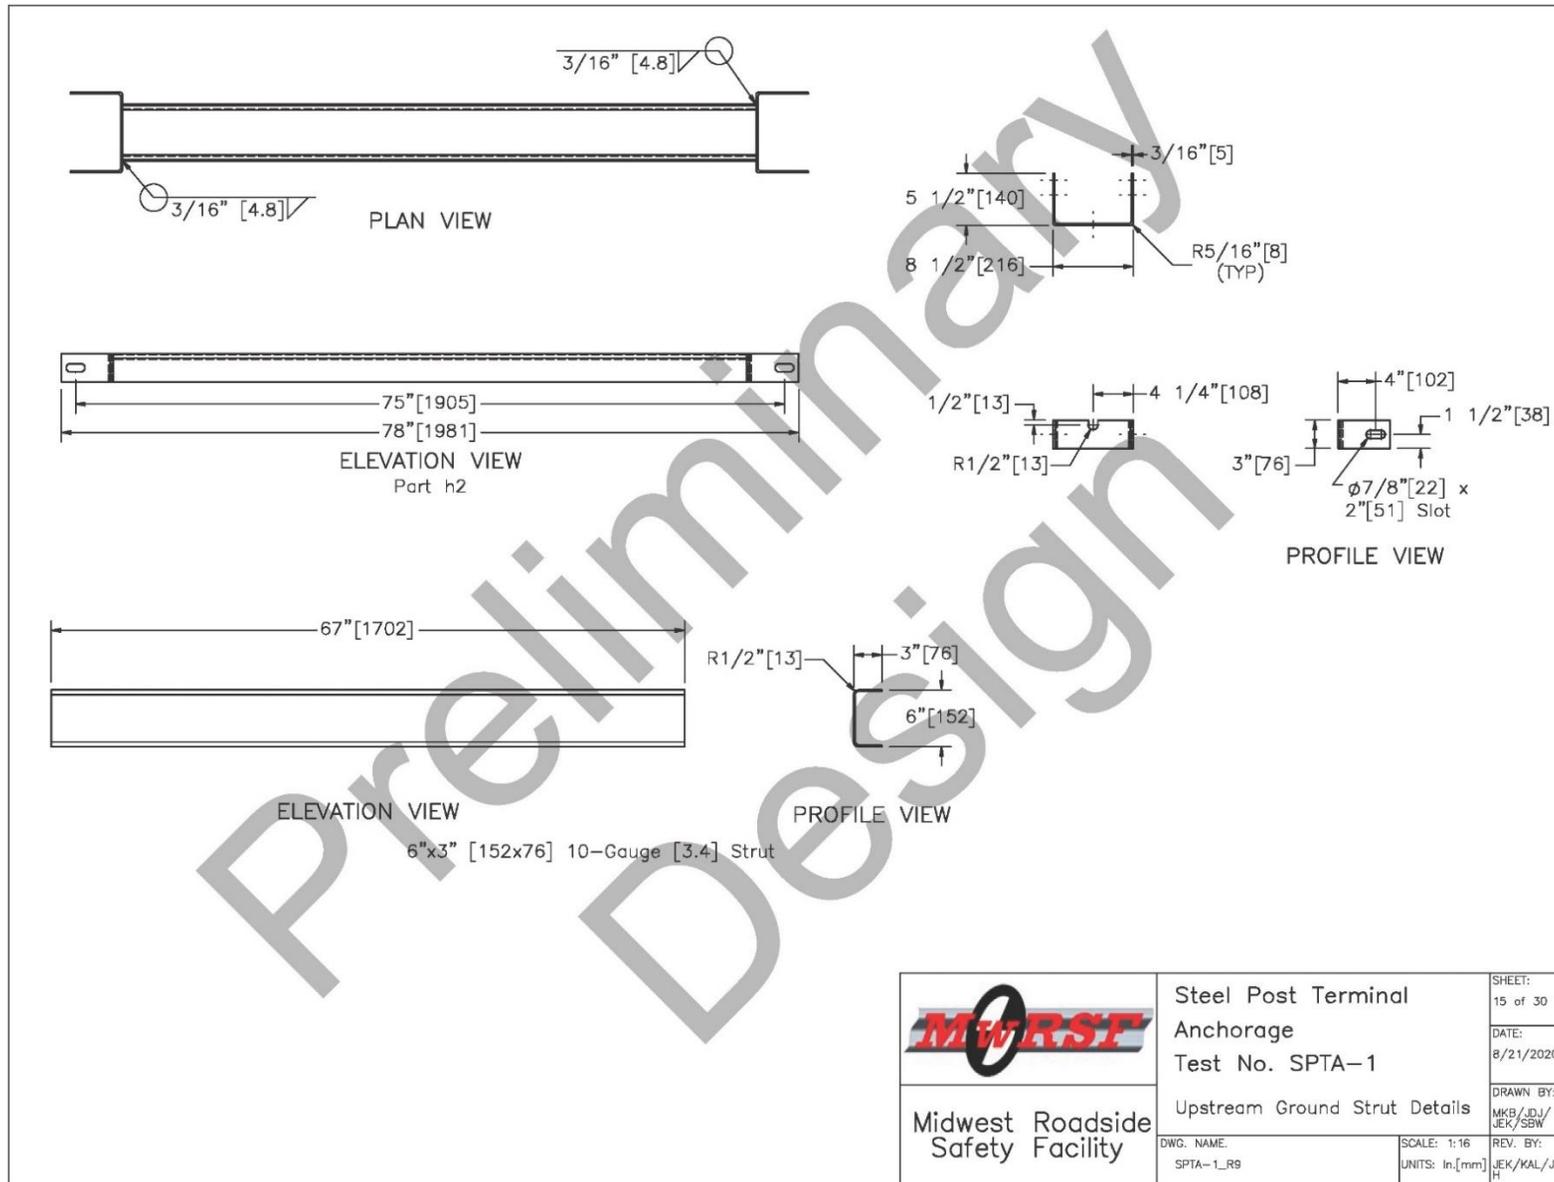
Upstream Ground Strut Details, Test No. SPTA-1
